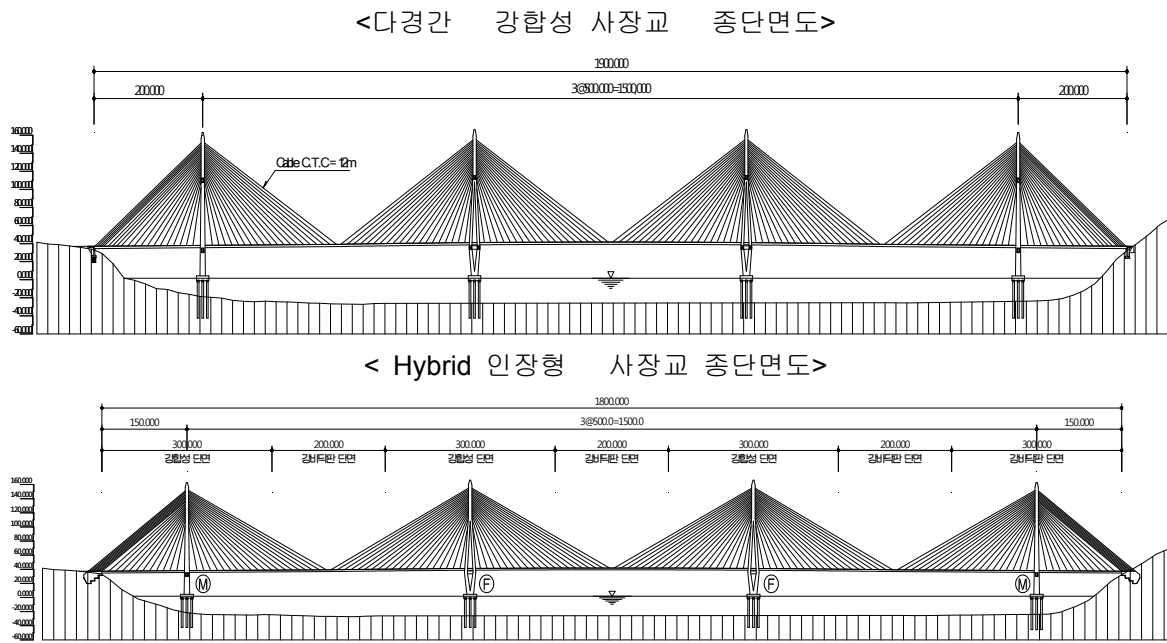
Longitudinal Plan for Cable Stayed Bridges
